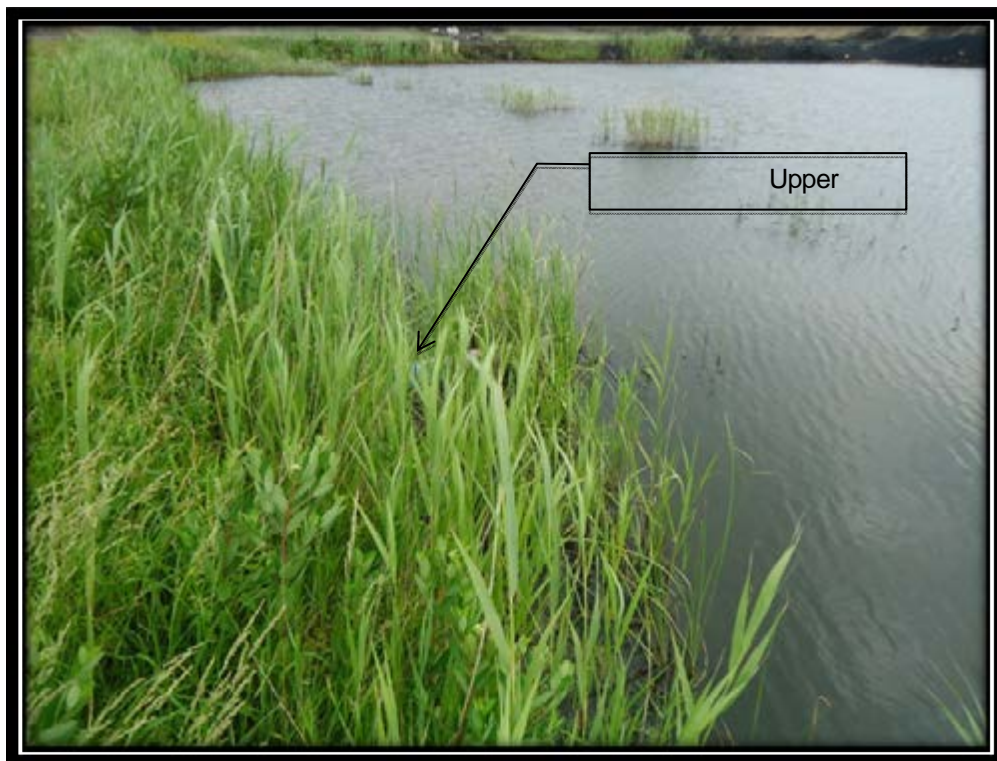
Ash Pond 1 Upper Discharge Pipe into Pond 4
